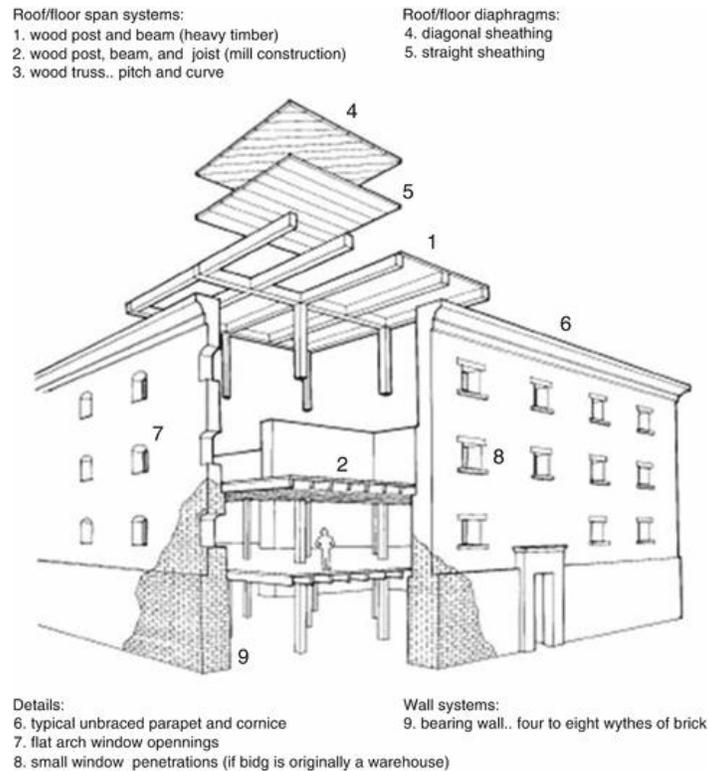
Artist's rendering of a typical heavy timber structure's components [8]
